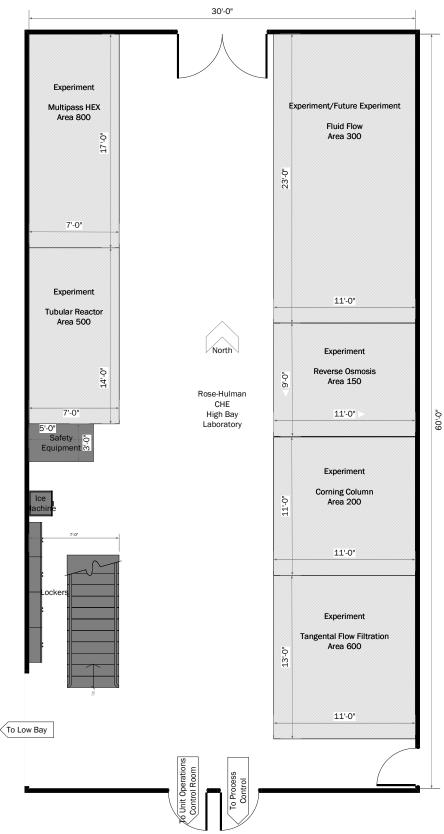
High Bay Laboratory (O-100) Floor Plan
